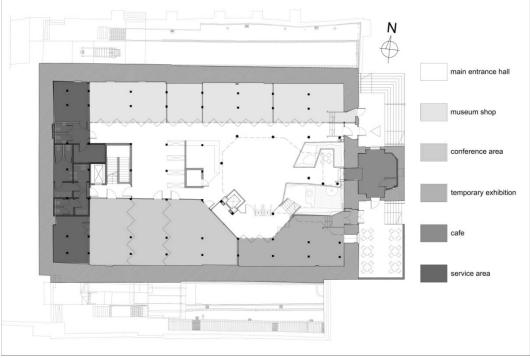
The ground floor plan of The New Amber Museum in the Great Mill.
